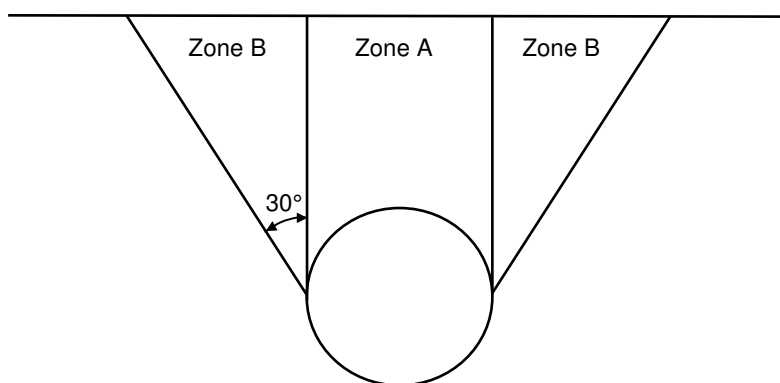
Zone of pile movement around a tunnel (after Kaalberg et al., 1999)
